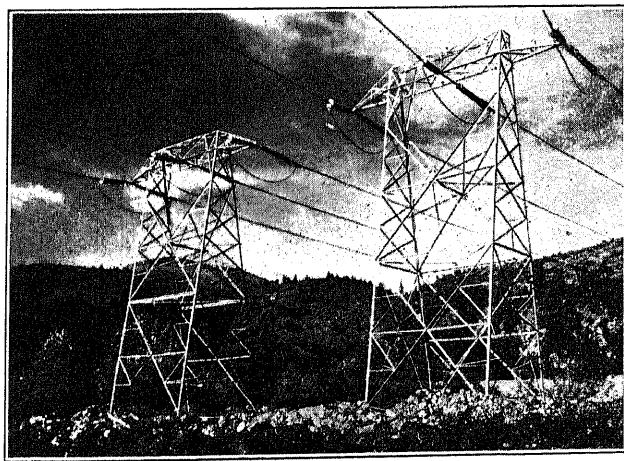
ANCHOR TOWERS, 220-KV. LINES
